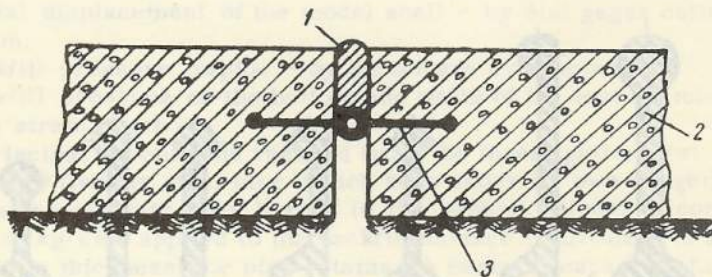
Arrangement of a profile-rubber strip seal in a joint of a monolithic concrete canal lining
